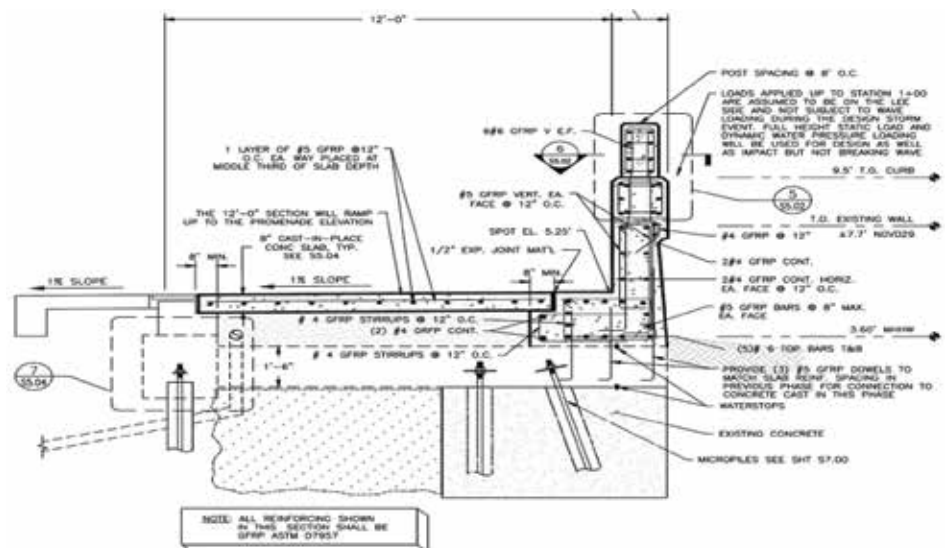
Typical section showing installed micropiles and GFRP structural reinforcing for the seawall structure with promenade
